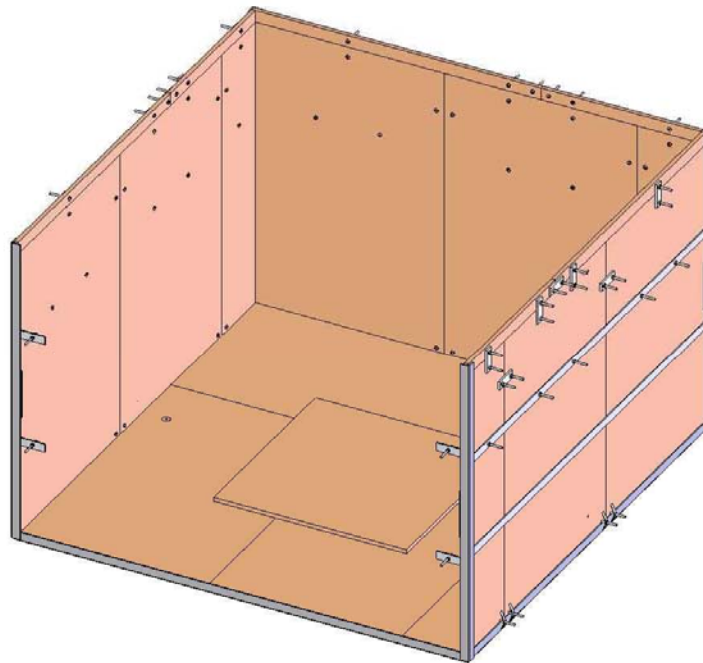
3/8 Scale Model Construction of Walls and Floor
